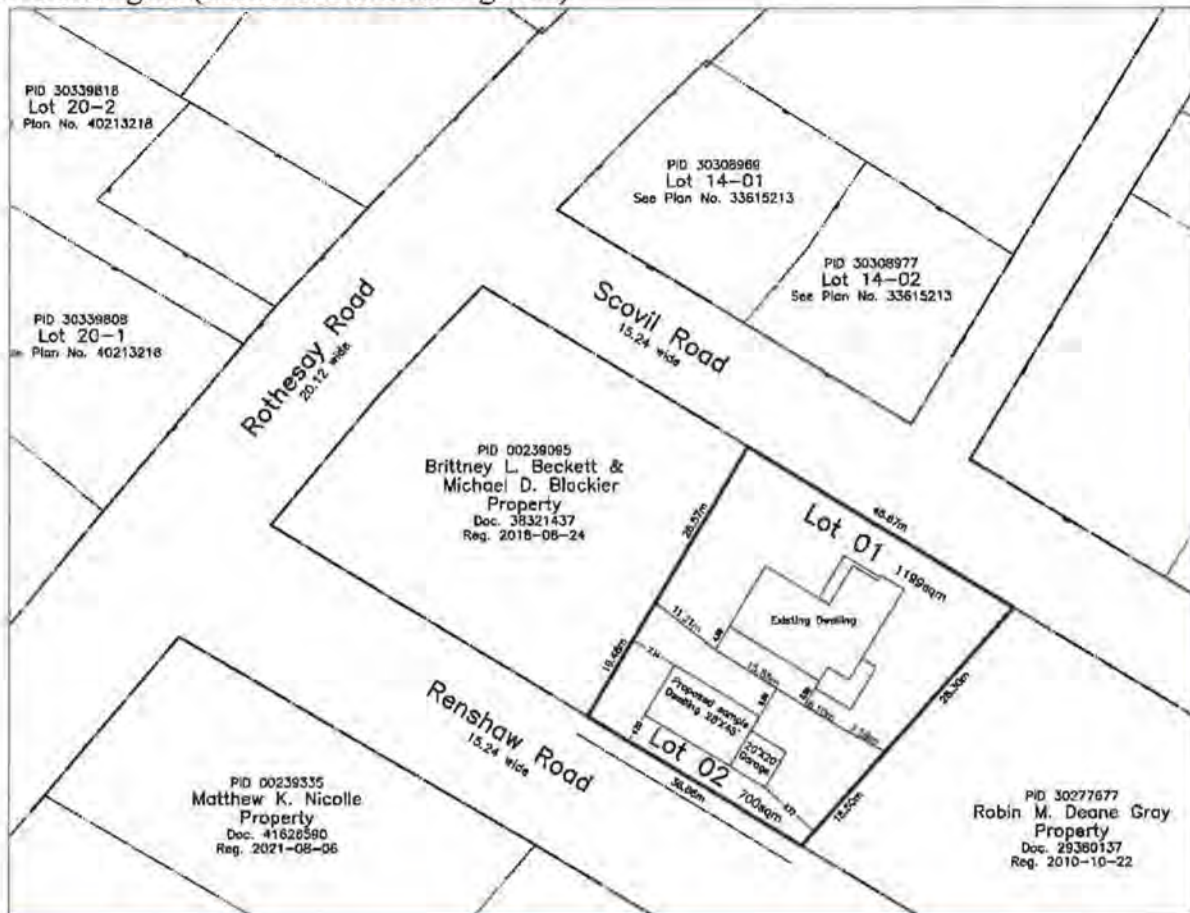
Proposed subdivision of subject site. Lot 02 is to be rezoned from R1-B to R1-E.
